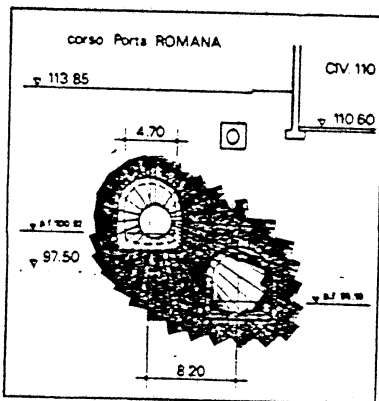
Permeation Grouting From Upper Pilot, to Permit Excavation of Two Parallel Tunnels at Different Levels, Milano Metro.
